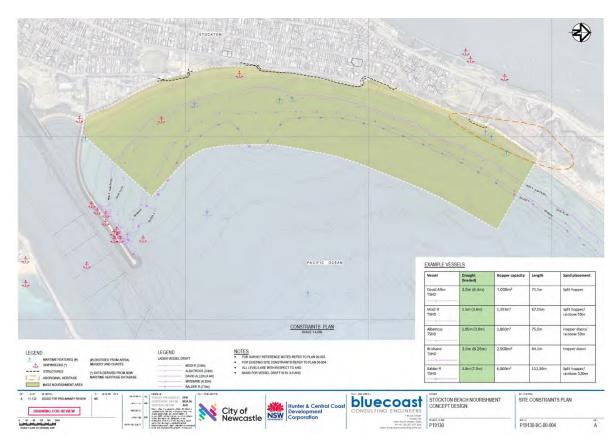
Stockton Beach Renourishment Site Constraints plan.98
